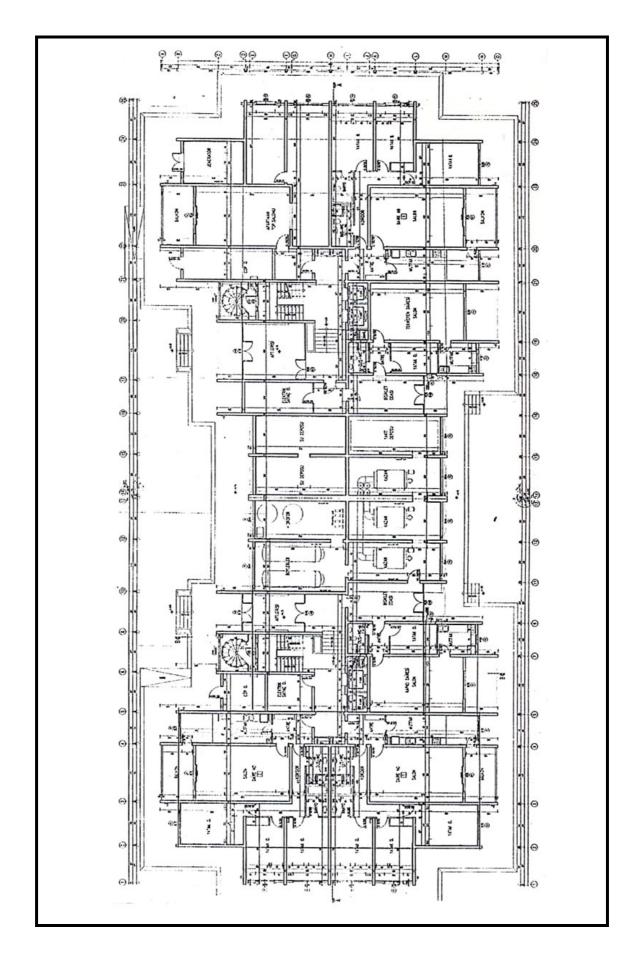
Mavişehir I; Pamukkale and Selçuk Ground Floor Plan
